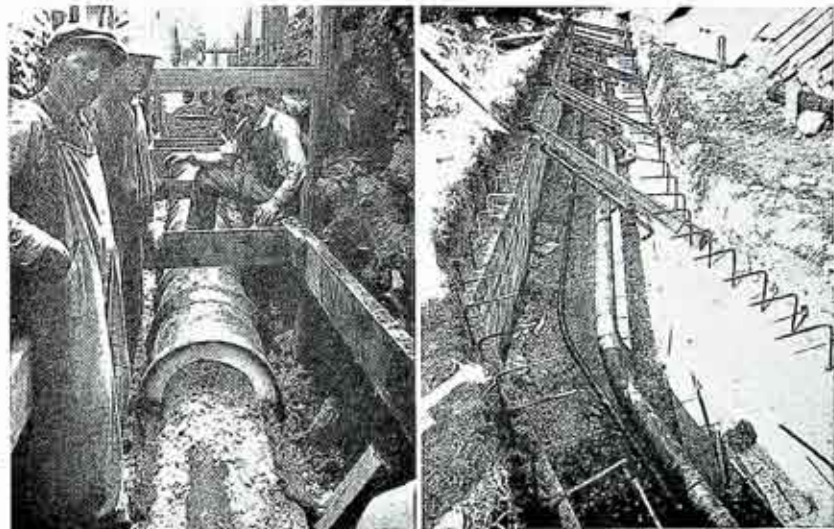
(Left), Close-up View of Tile Conduit and Insulation; Fig. 5 (Right), Method Employed in Allowing for a 30-in. Maximum Expansion.
